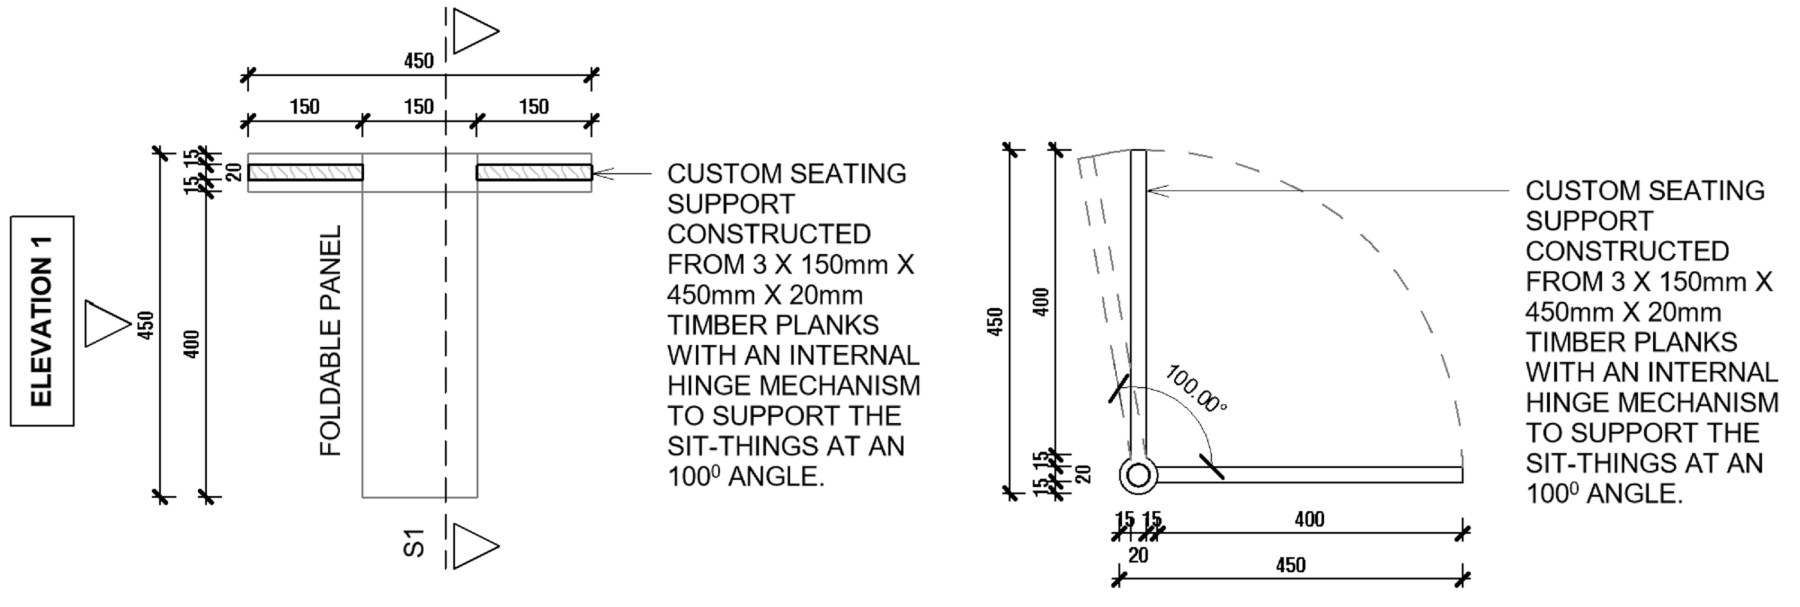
ELEVATION 2 ROLLED UP
